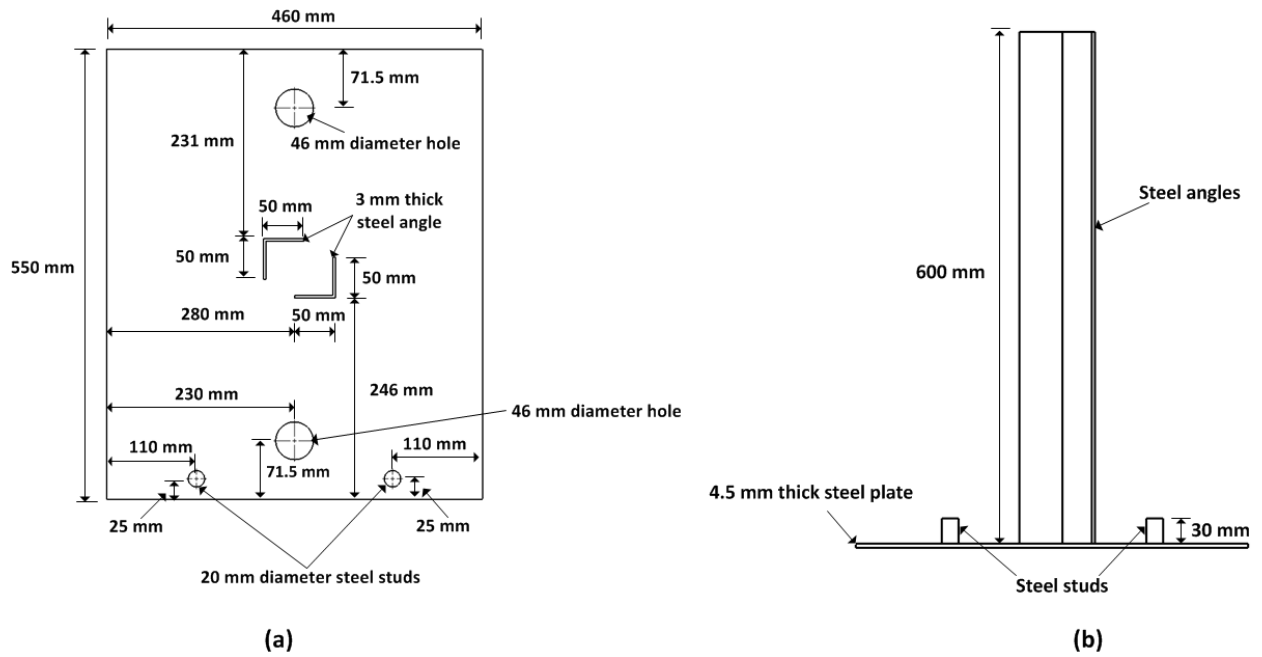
Details of the steel plate with welded steel angles and circular steel studs: (a) Plan-view and (b) Front-view
